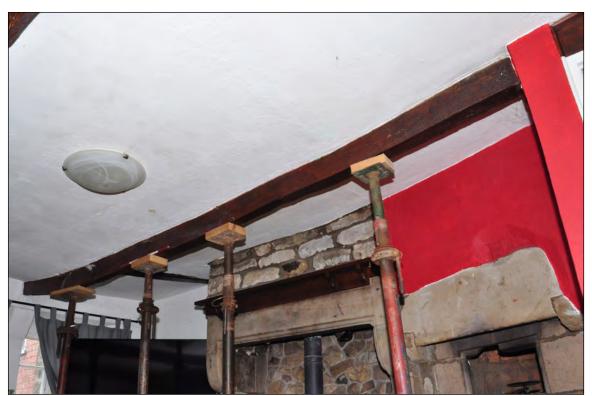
Beam 1 (firehood bressumer?), adjacent to fireplace in lounge/living room (before work). Looking south.
